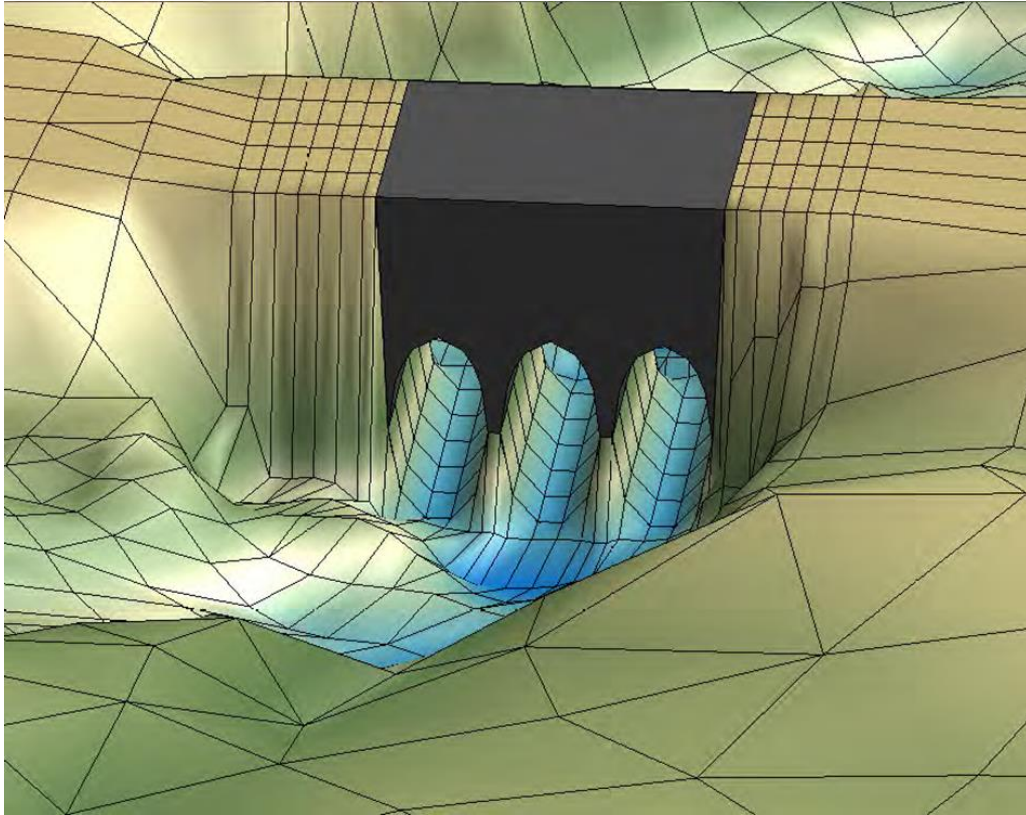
Image of multi-barrel culvert implemented with 3D structures tool.
